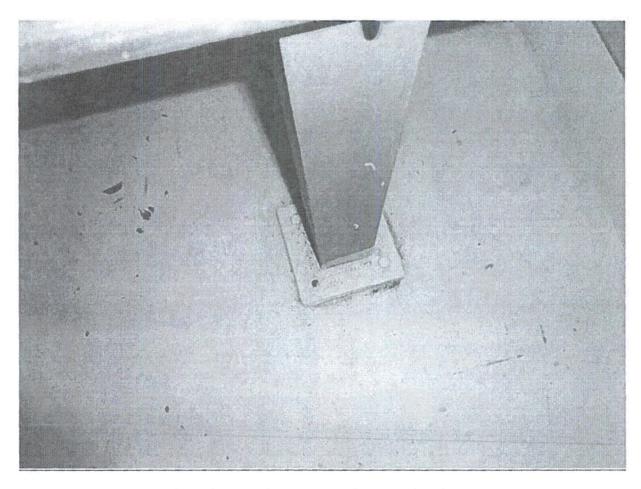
Conduit support in Torus Room Bay 10 with Missing Anchor
